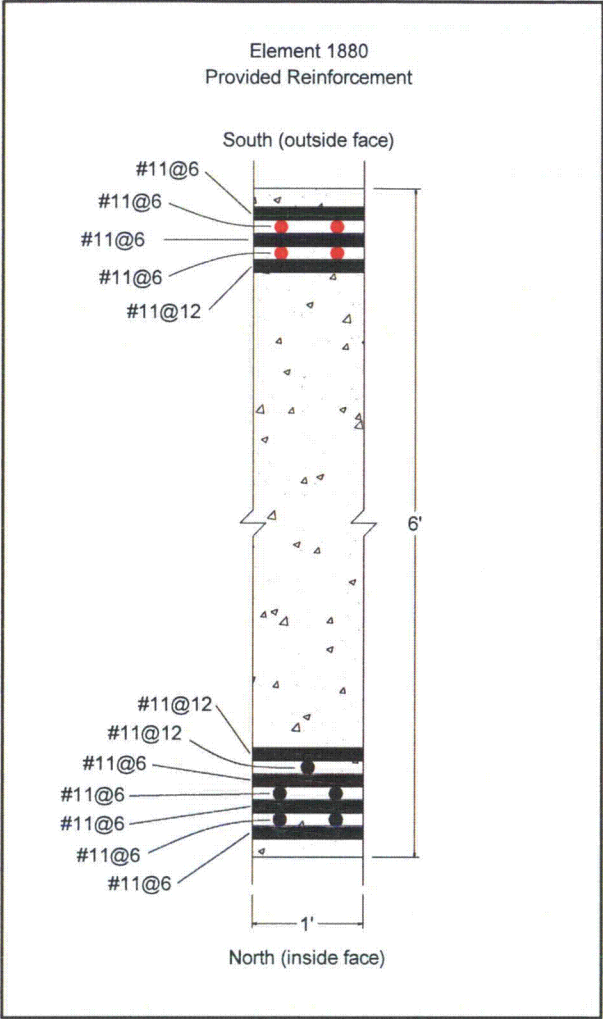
Cross Section of Wall with Reinforcement Provided for P & M and In-Plane Shear
